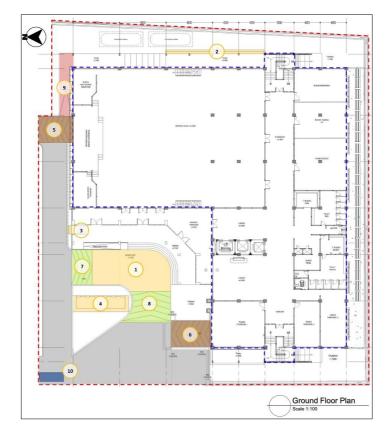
The calculation zone for albedo on the building's non-roof area of Riau Polytechnic Tower Source: Author, 2025
